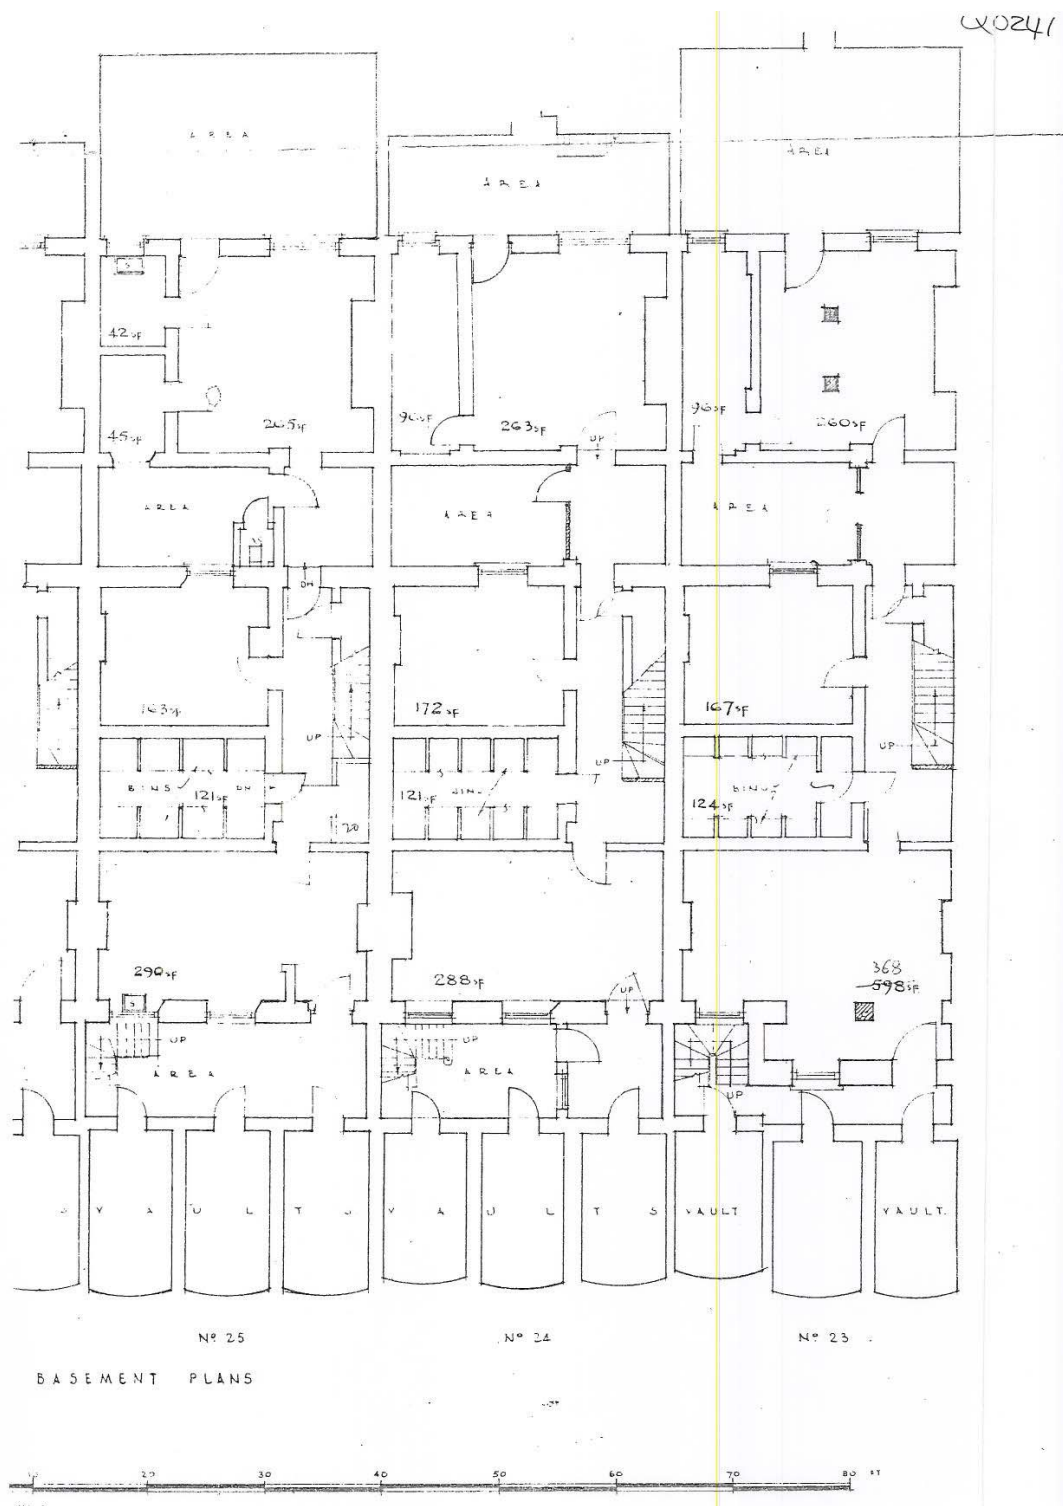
Extract from Ministry of Works Plans April 1946 Basement Plans Nos: 25 – 23 Chester Terrace – The Crown Estate Archives
